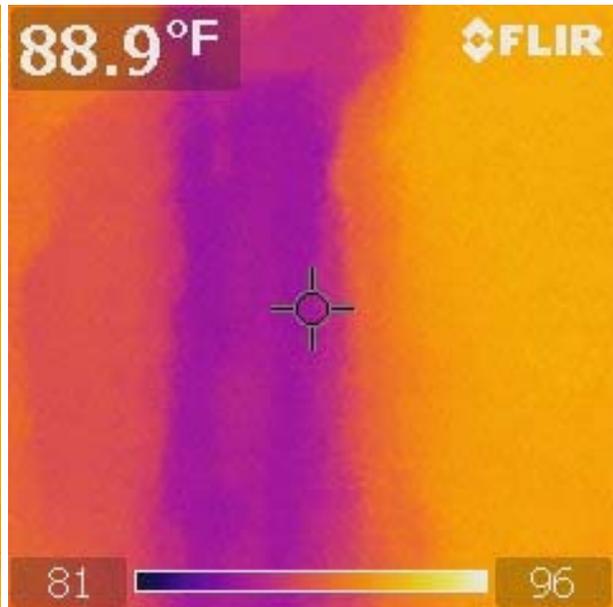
, IRT Image of the Wall Crack of Huanji Tulou
